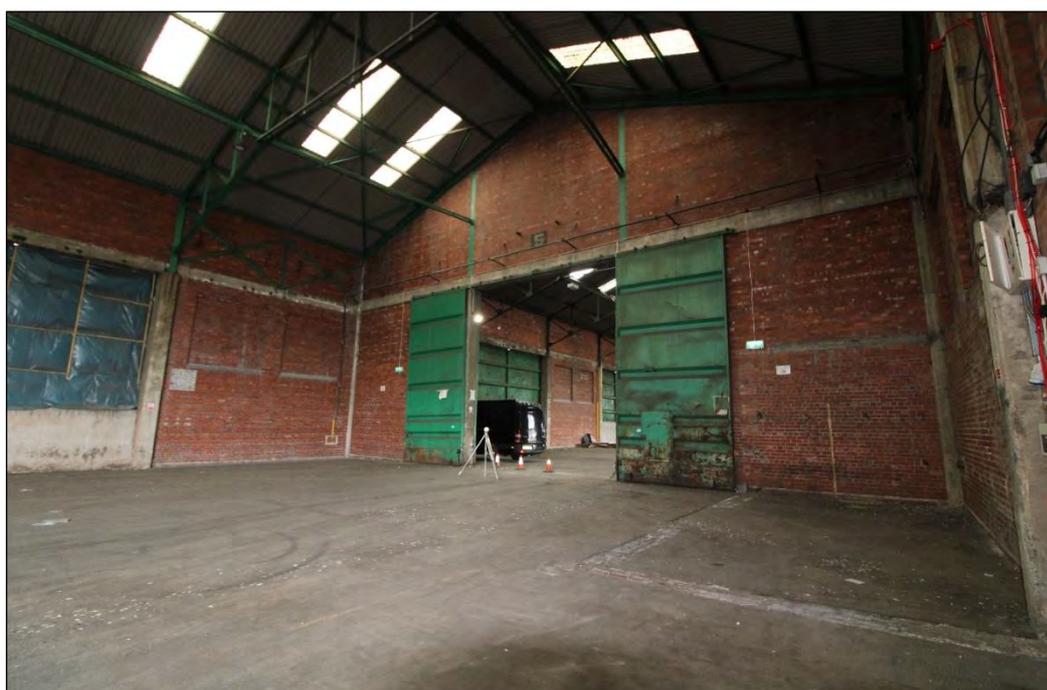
Cross-wall entrance between Western and Central Sheds. Note footing of a demolished single-storey structure to the right of the frame
